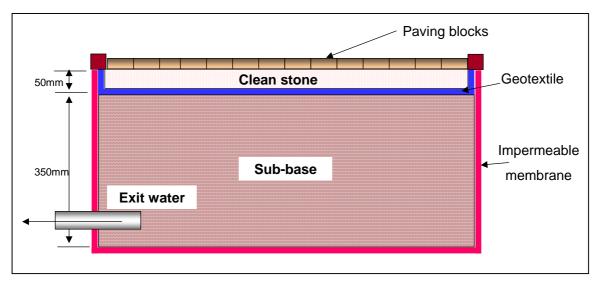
Cross-section of a typical modular block tanked system (Formpave®, 2000). (Not to scale)
